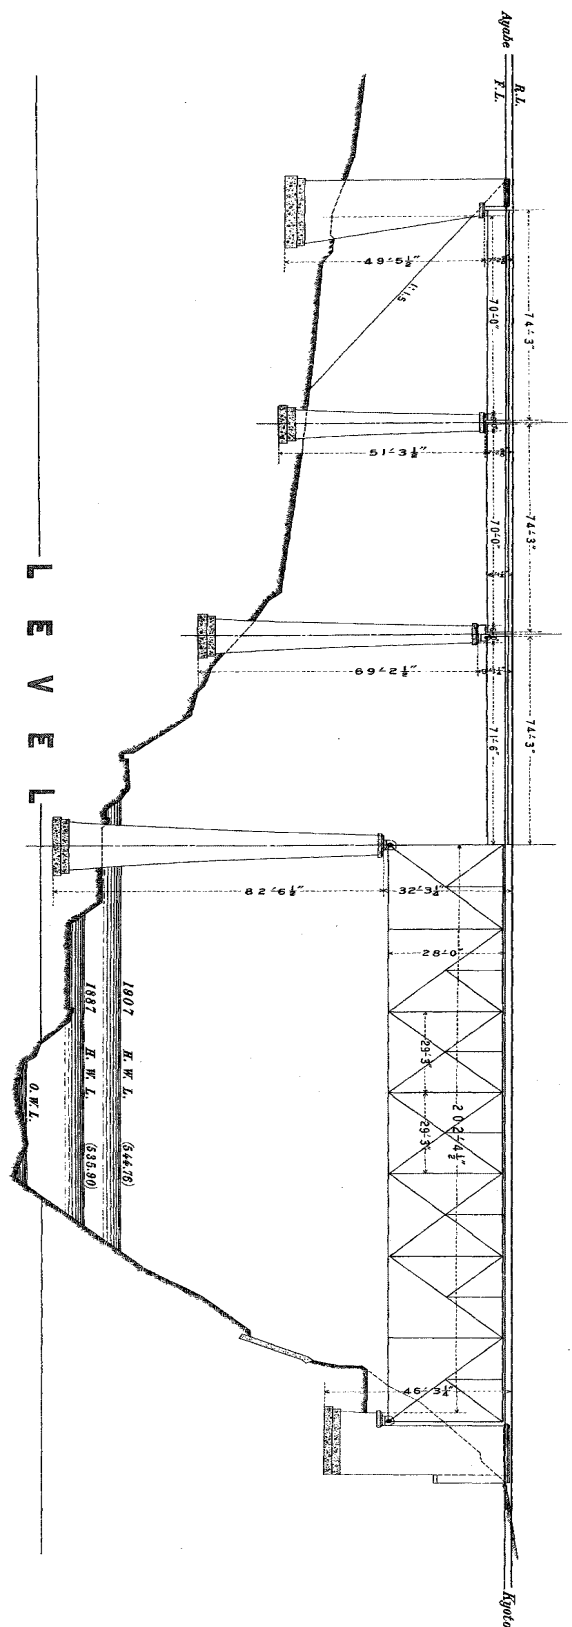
The Shichimi-gawa Bridge. Elevation.
